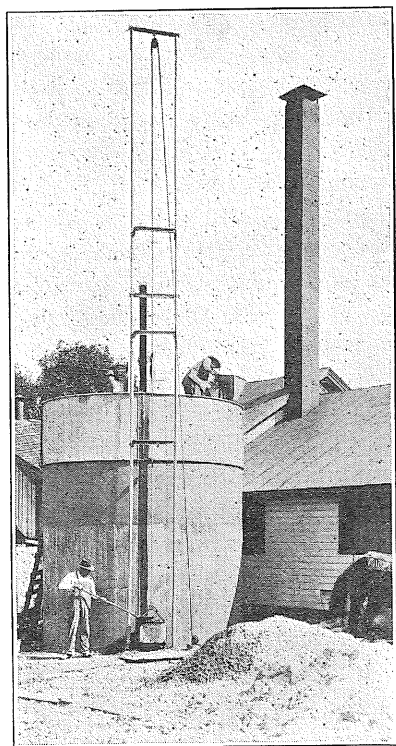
MONOLITHIC CONCRETE SILO UNDER CONSTRUCTION
